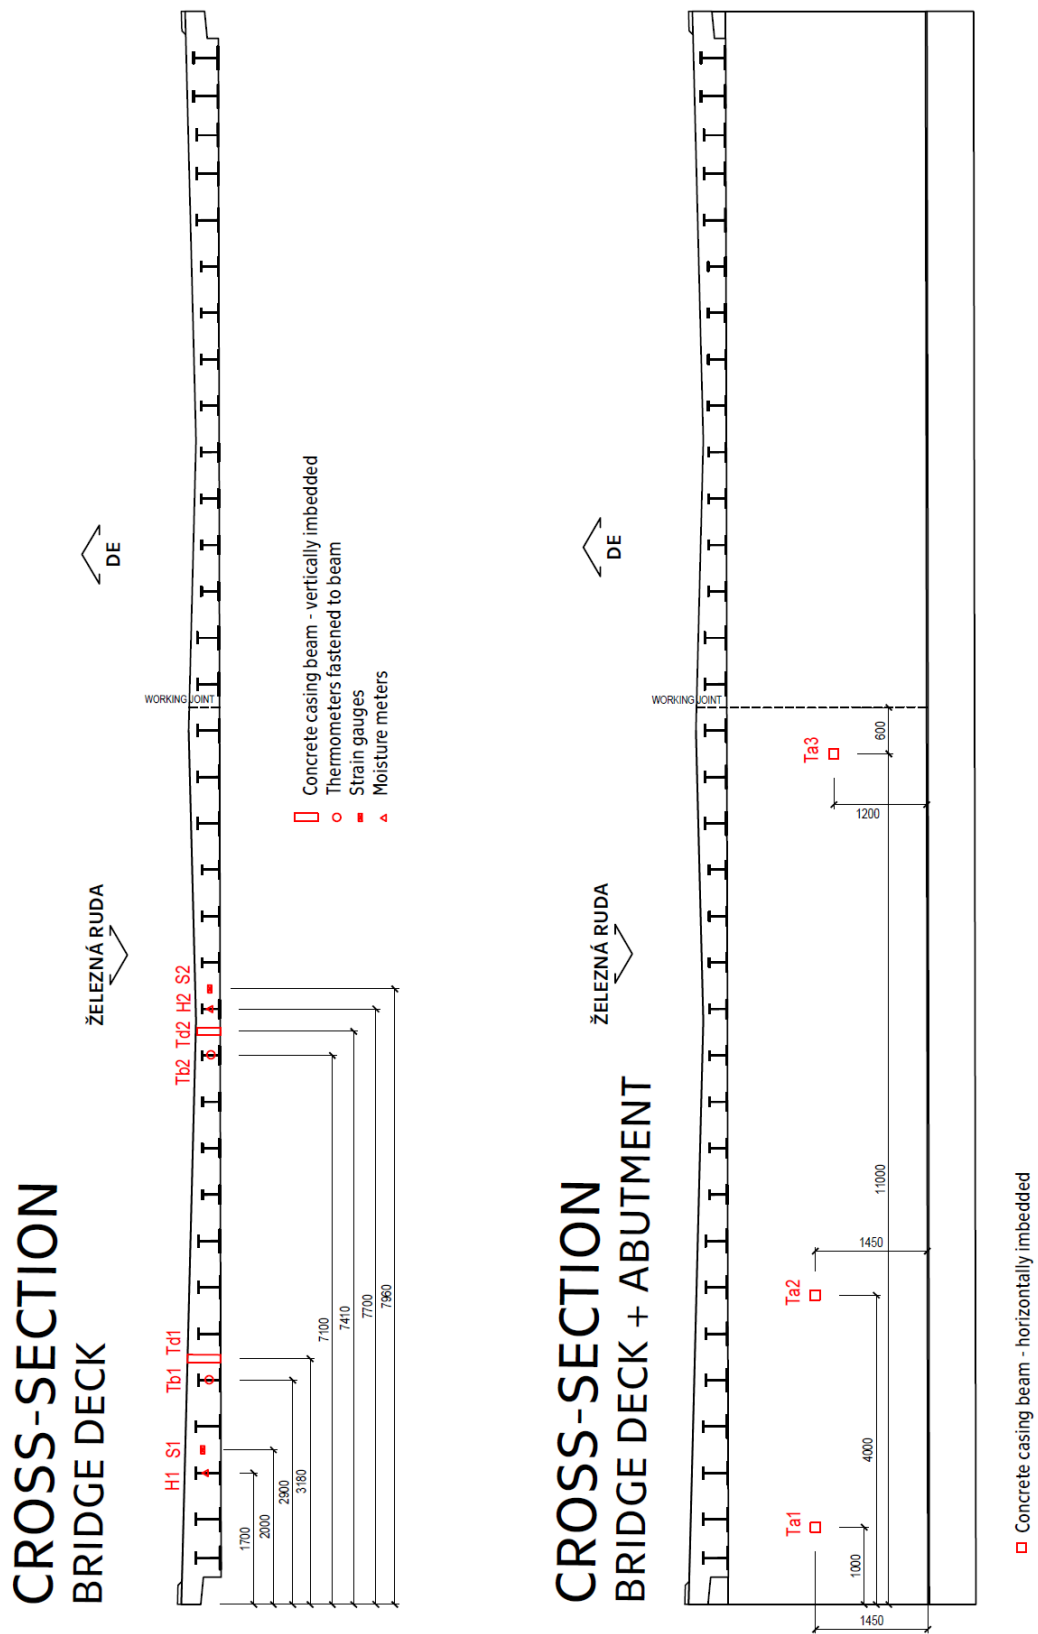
Deployment of sensors in bridge structure marked in cross-sections
